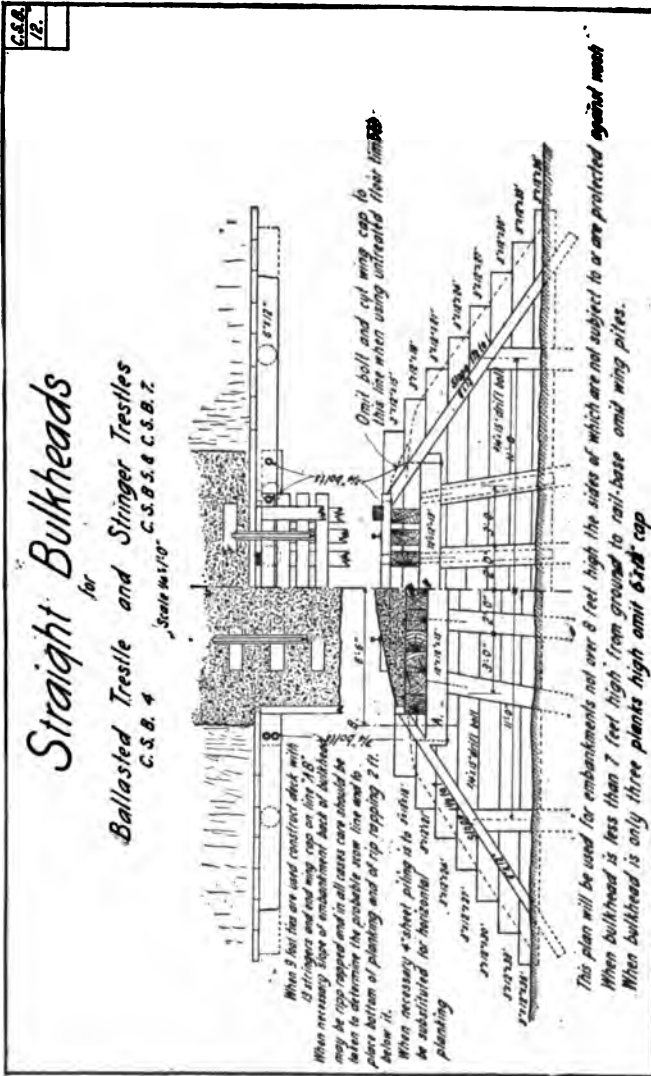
END CONSTRUCTION FOR TRESTLE ADJOINING EMBANKMENTS, DULUTH AND IRON RANGE R. R. REPORT ON BEST END CONSTRUCTION OF TRESTLES ADJOINING EMBANKMENTS.
